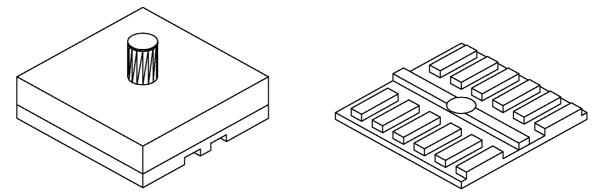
Air inlet and outlet for dryable insulation system viewed from above and below
